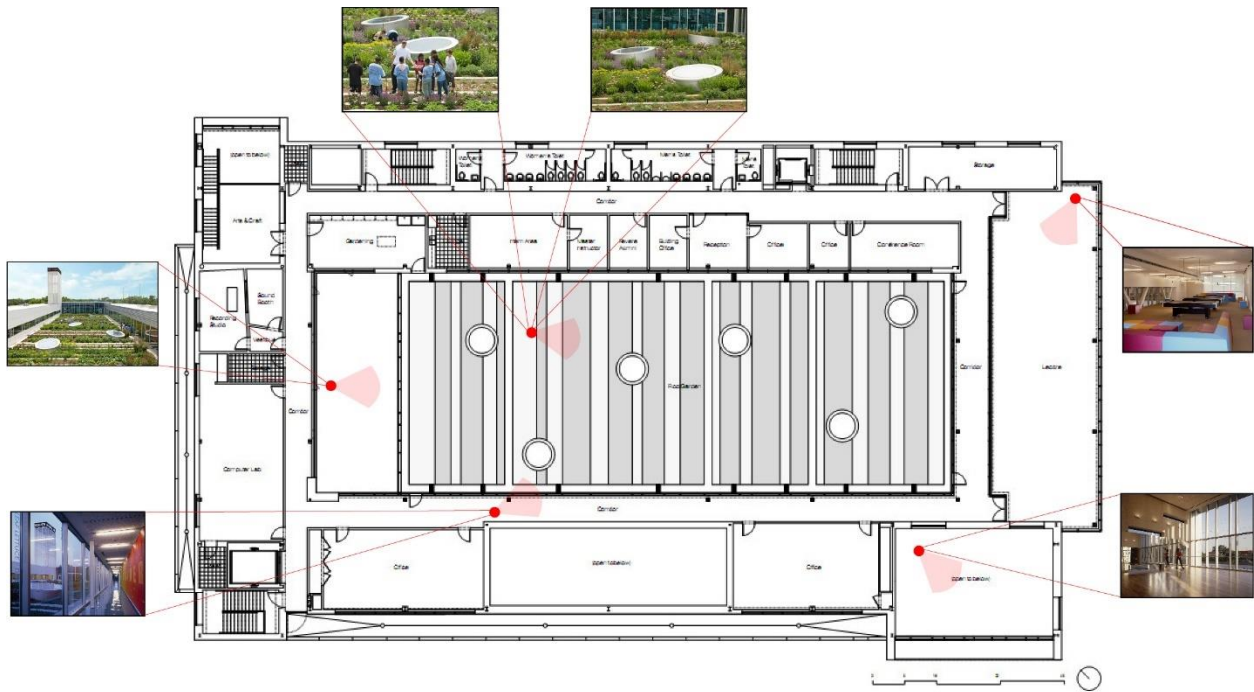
Floor plan of upper level and roof. Gary Comer Youth Center designed by John Ronan Architects in 2006. (Hall and Blessin, 2006). <https://www.archdaily.com/189411/the-gary-comer-youth-center-john-ronan-architects>
